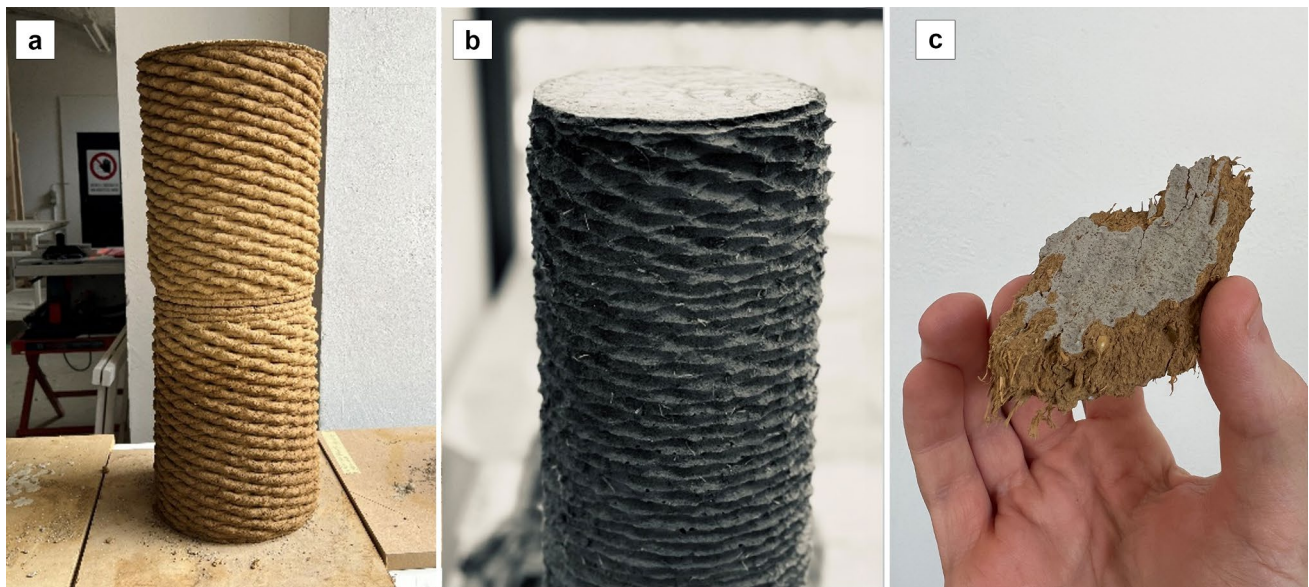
a Assembled Earth formwork in dry state, b Demoulded concrete sample, c A thin layer of concrete remains attached to the fully-dry demoulded formwork
